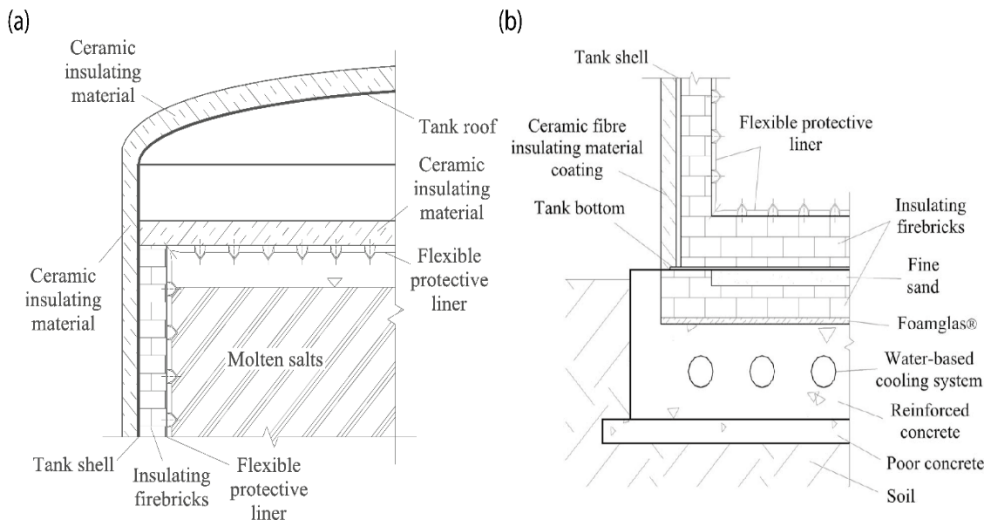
A cross-section for the molten salts storage tank where:(a) roof & (b) construction base [58]
